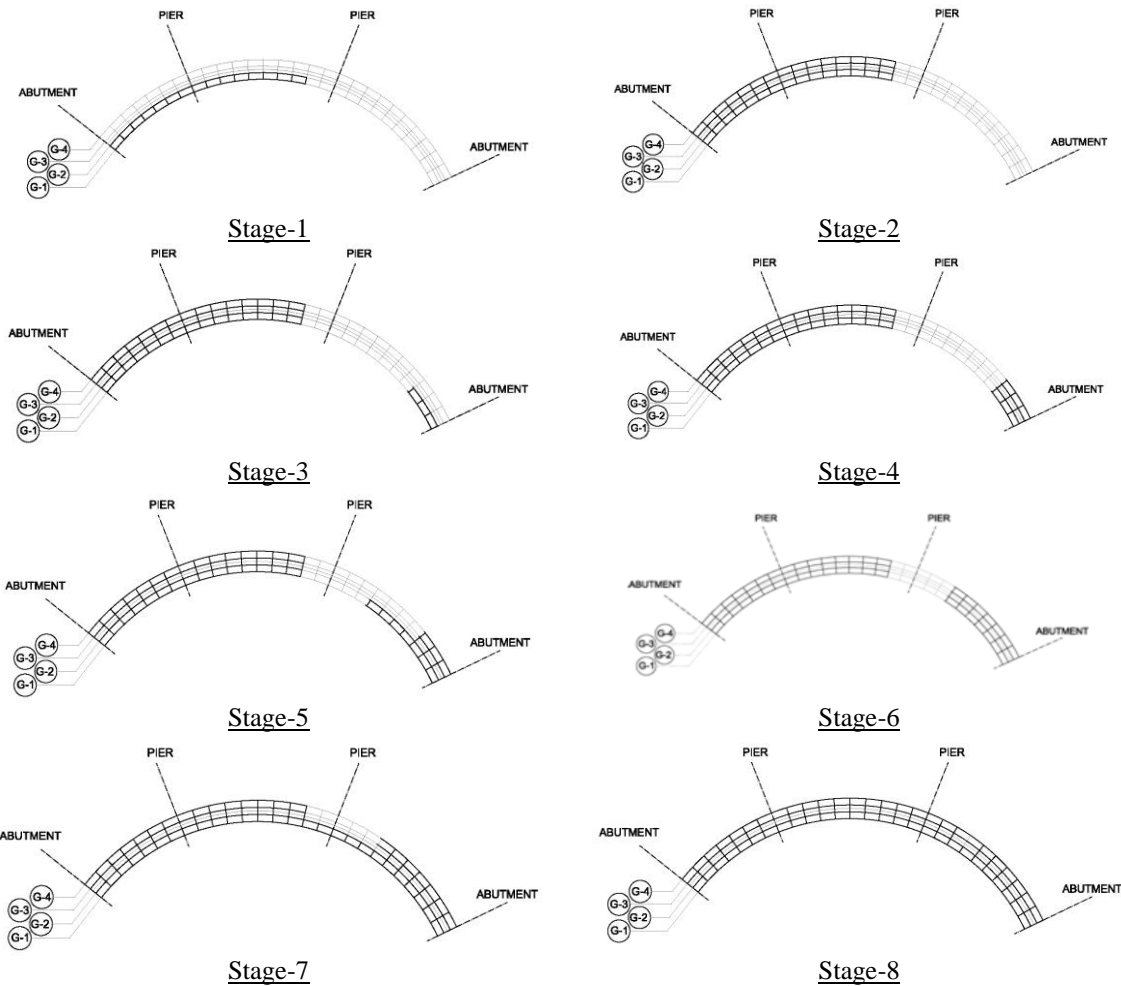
Stage 1 to Stage 8 of Construction for “Drop-In” Erection of Bridge C-11.
